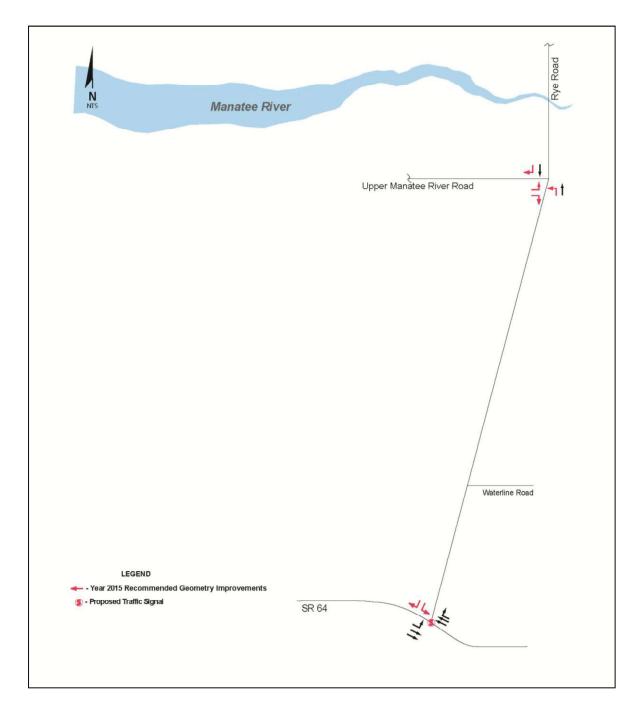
OPENING YEAR (2015) RECOMMENDED INTERSECTION GEOMETRY RYE ROAD ALTERNATIVE - NORTH SECTION
